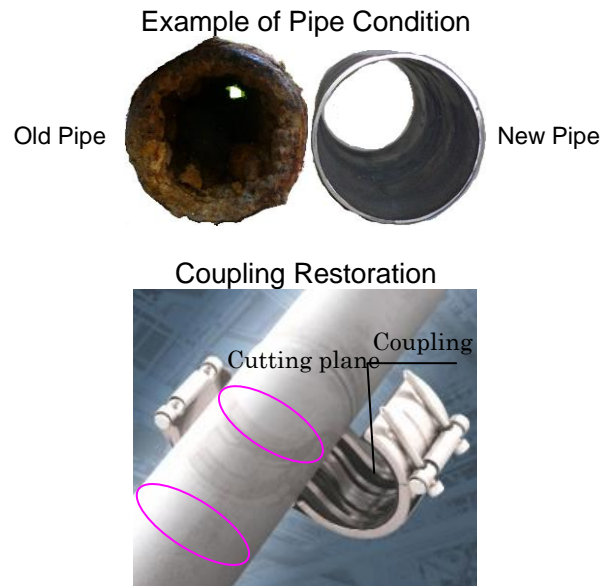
Internal/external Condition of Pipe and Method of Pipe Connection
